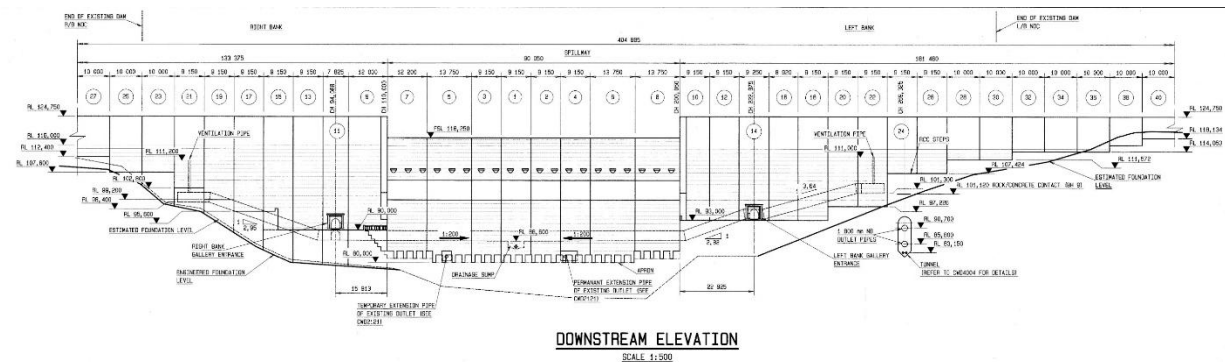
Downstream elevation of the approved Dam wall raising (Department of Water and Sanitation, 2017)
